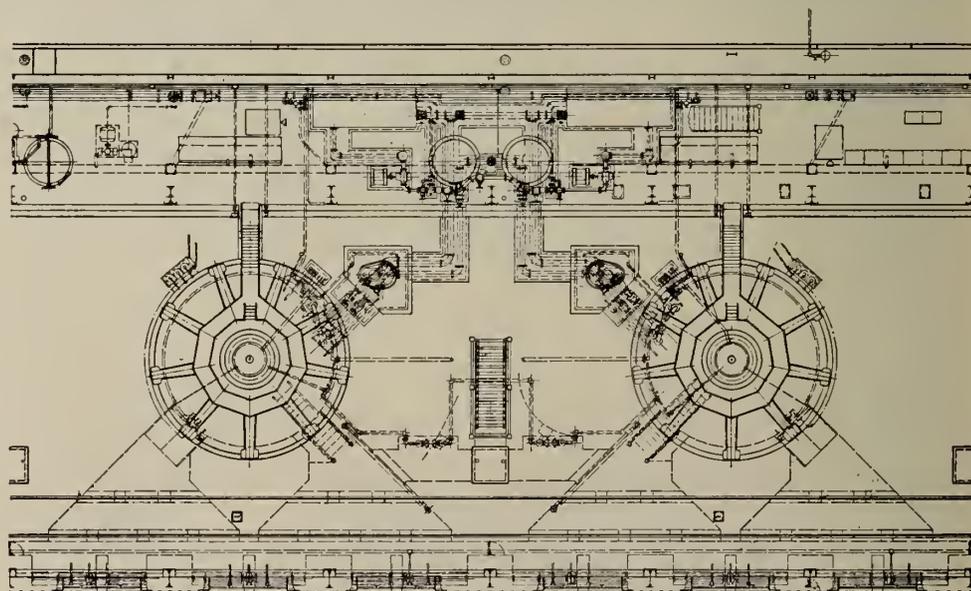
Generator Floor Plan showing typical arrangement of each pair of Units.
